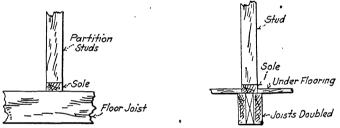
Partition crosswise of joists. Fig. 136.—Partition parallel to joists.
